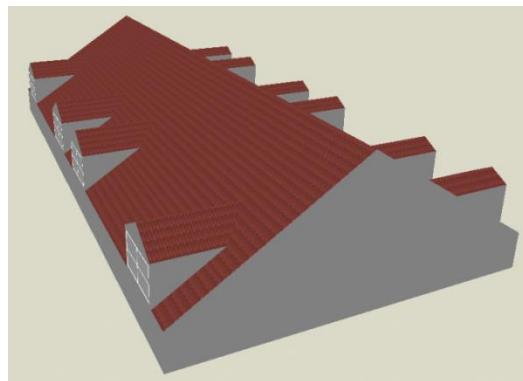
Back side of the building, towards the back yard with attic windows (AutoCAD).
